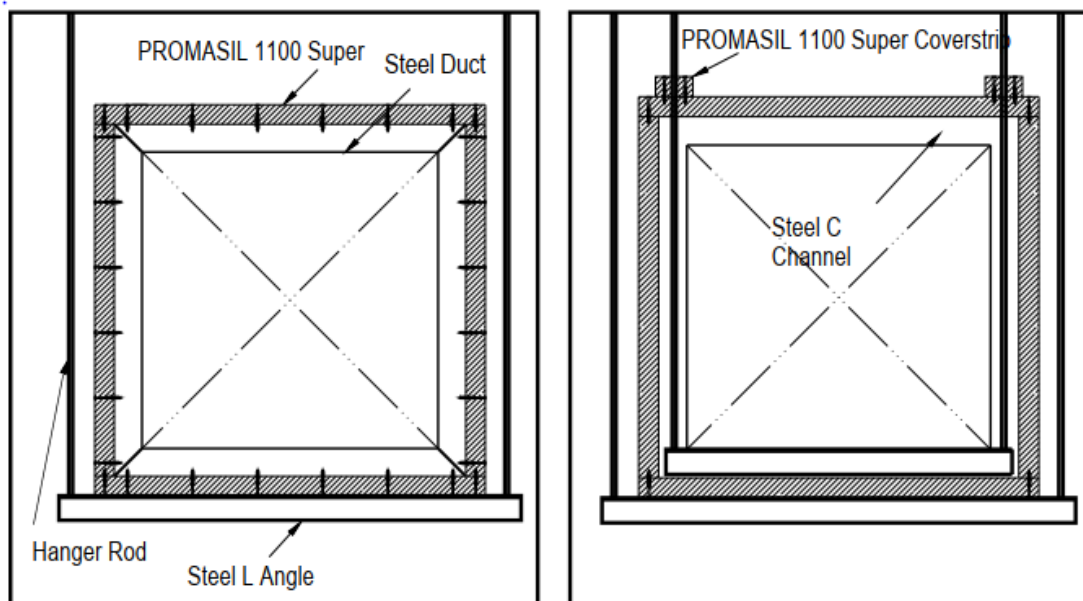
Section views of steel duct system protected with PROMASIL®1100 boards
